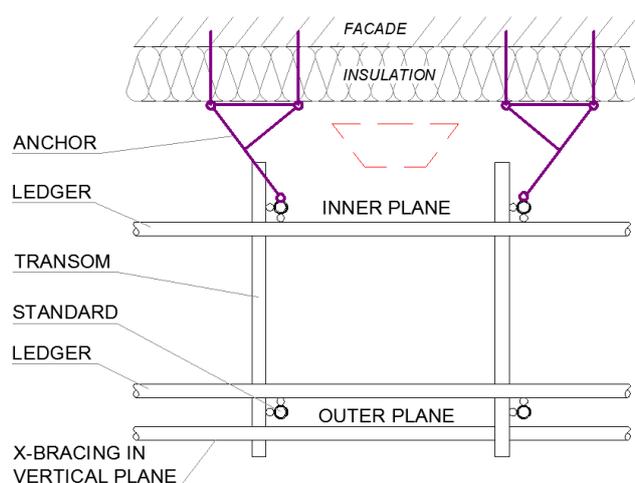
The plane view on the scaffolding with the anchoring by two Lever Anchors.
